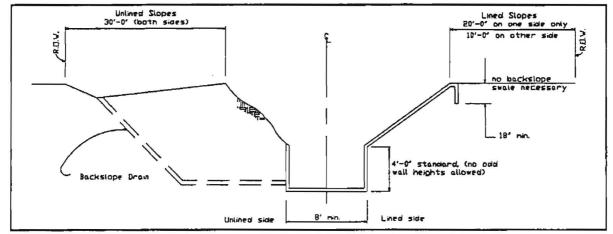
Typical Section - Concrete-Lined Low Flow Channel
